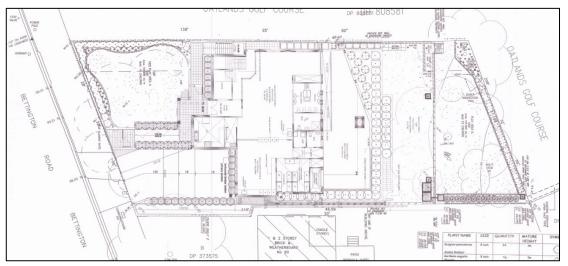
Approved ground floor plans (DA/491/2006) child care centre, 92 Bettington Road
